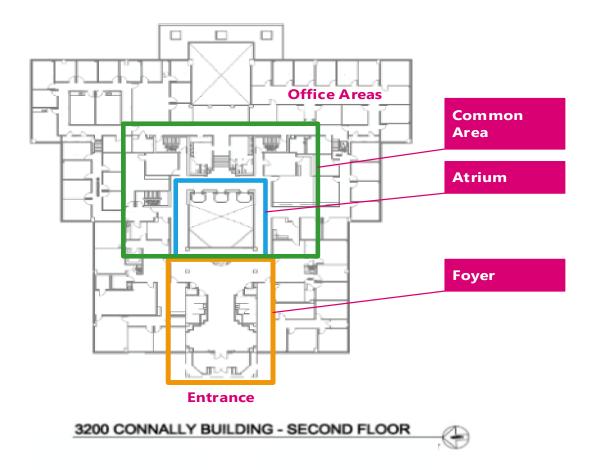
Typical Diagrammatic Floor Plan of JBC Building (Floors 1-3)
